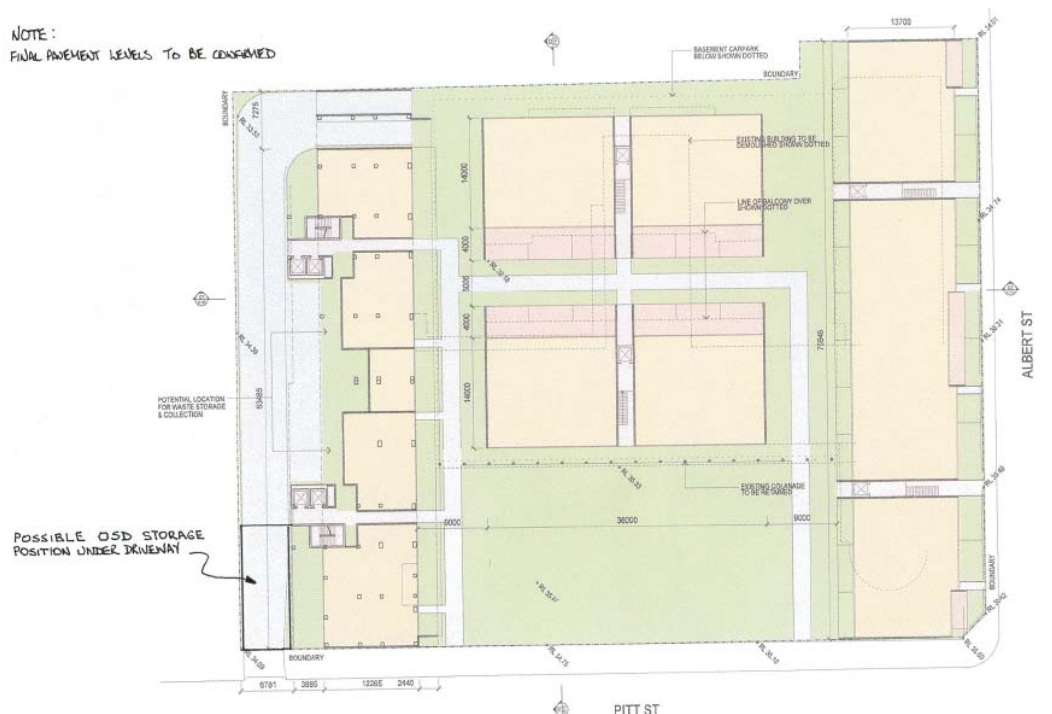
Site plan illustrating possible location of On-site Stormwater Detention system underneath proposed driveway in the south eastern corner of the site.
